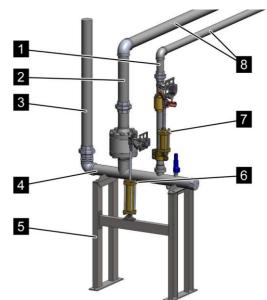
Mounting selector valves DN65/DN80/DN100 $(2 \frac{1}{2}"'/3"/4")$
